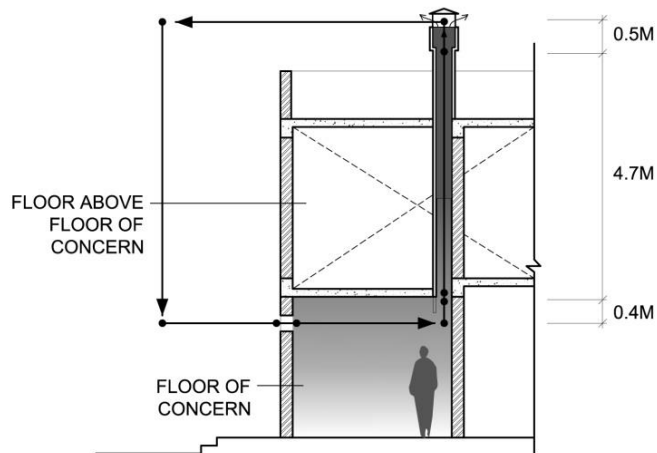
SECTION CC' THROUGH THE TOILET WITH SUNKEN SLAB – CASE (B)
